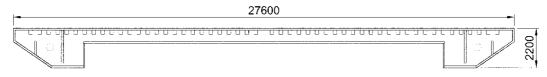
Schematic cross section of Hong-guang Bridge (unit: mm)
